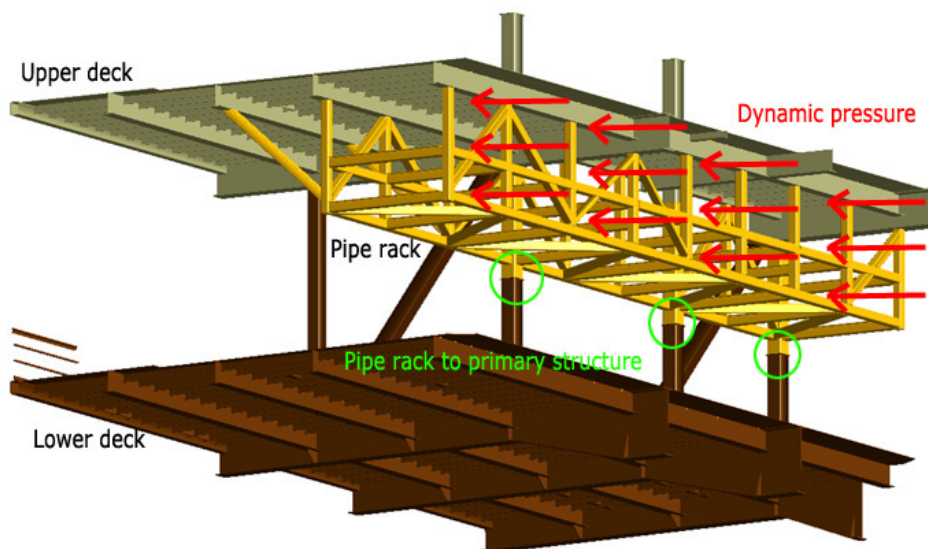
The pipe rack is welded directly to the upper deck girders as shown. The pipe rack is also connected to the primary structure (column) as shown marked with green.
